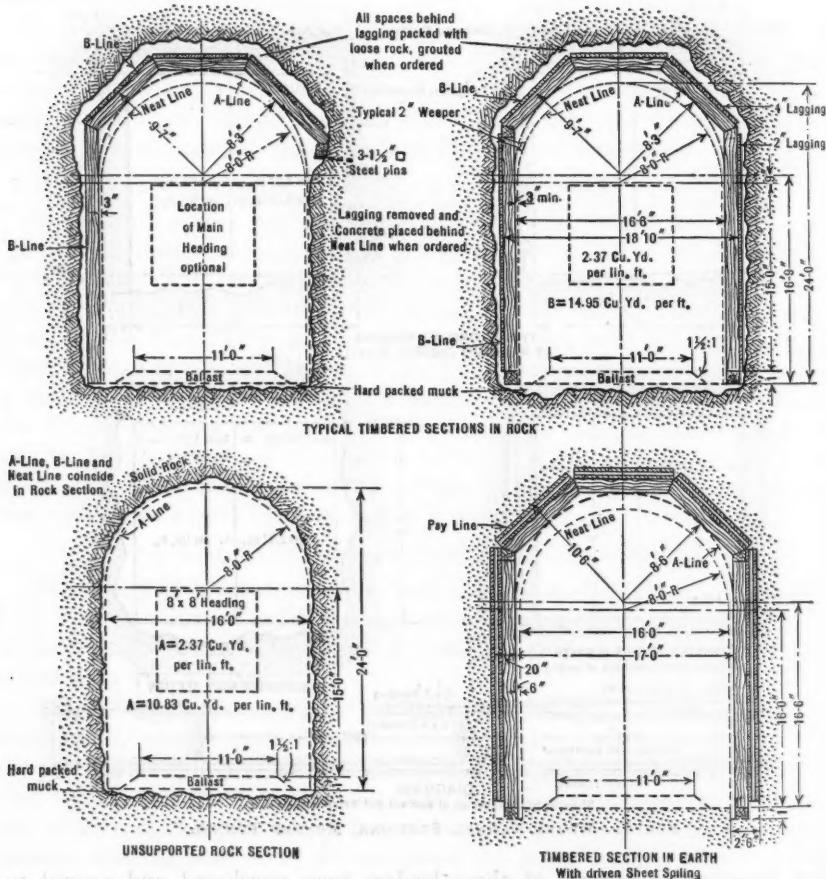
RAILROAD TUNNEL SECTIONS, MOFFAT TUNNEL.
